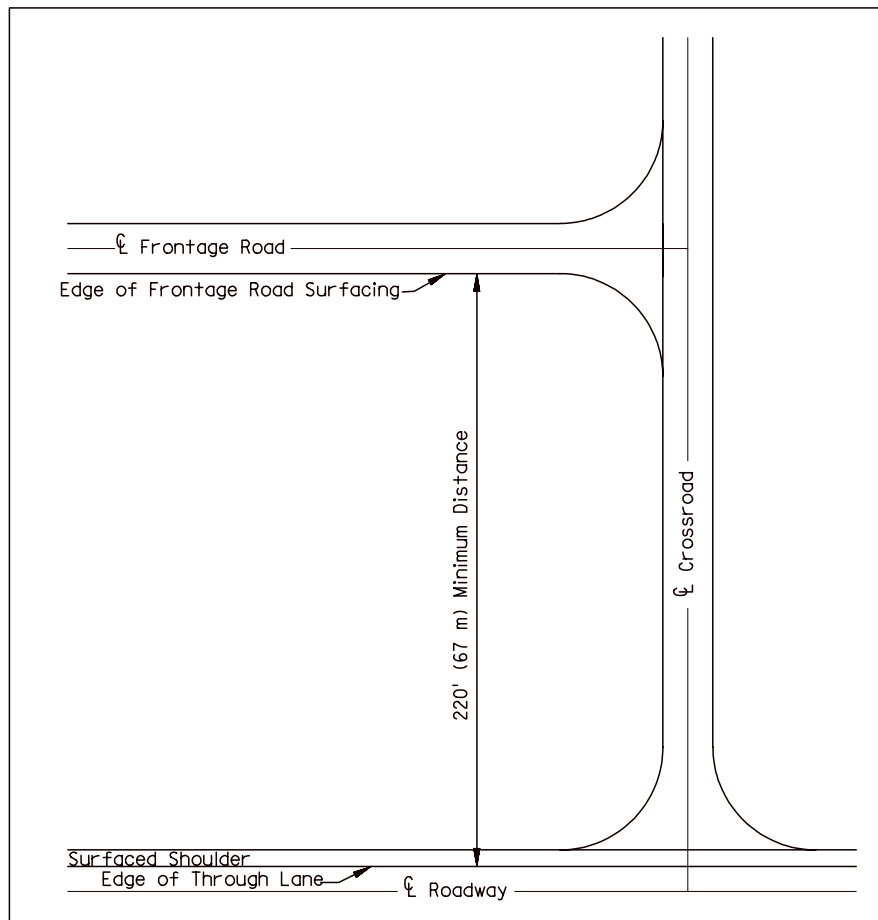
Typical Frontage Road Connection off of a Crossroad
